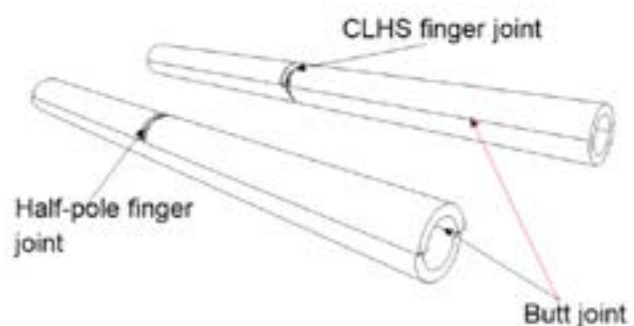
Schematic drawing of a half-pole finger joint HFJ (left) and finger jointing of the complete CLHS cross-section FFJ (right)
